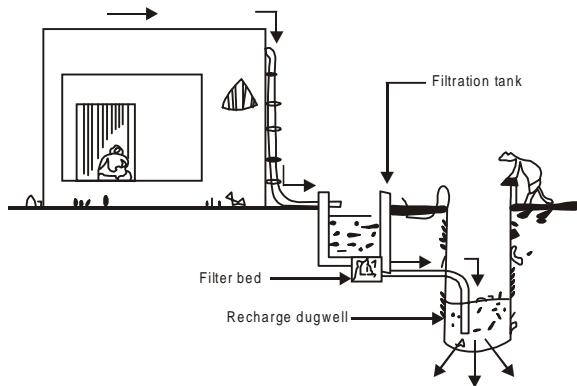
Recharging a dug well with harvested roof water (Ranade, 2000).
